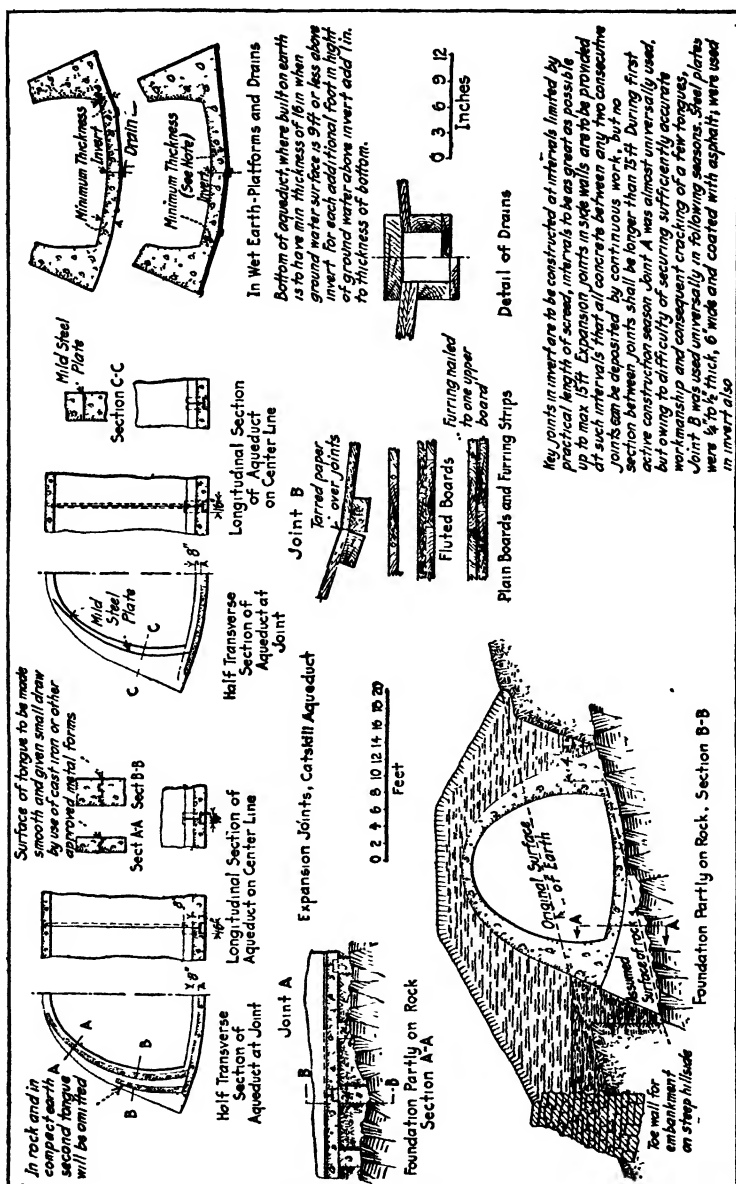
Catskill aqueduct. Standard details in open cut. Expansion joints and drains.
